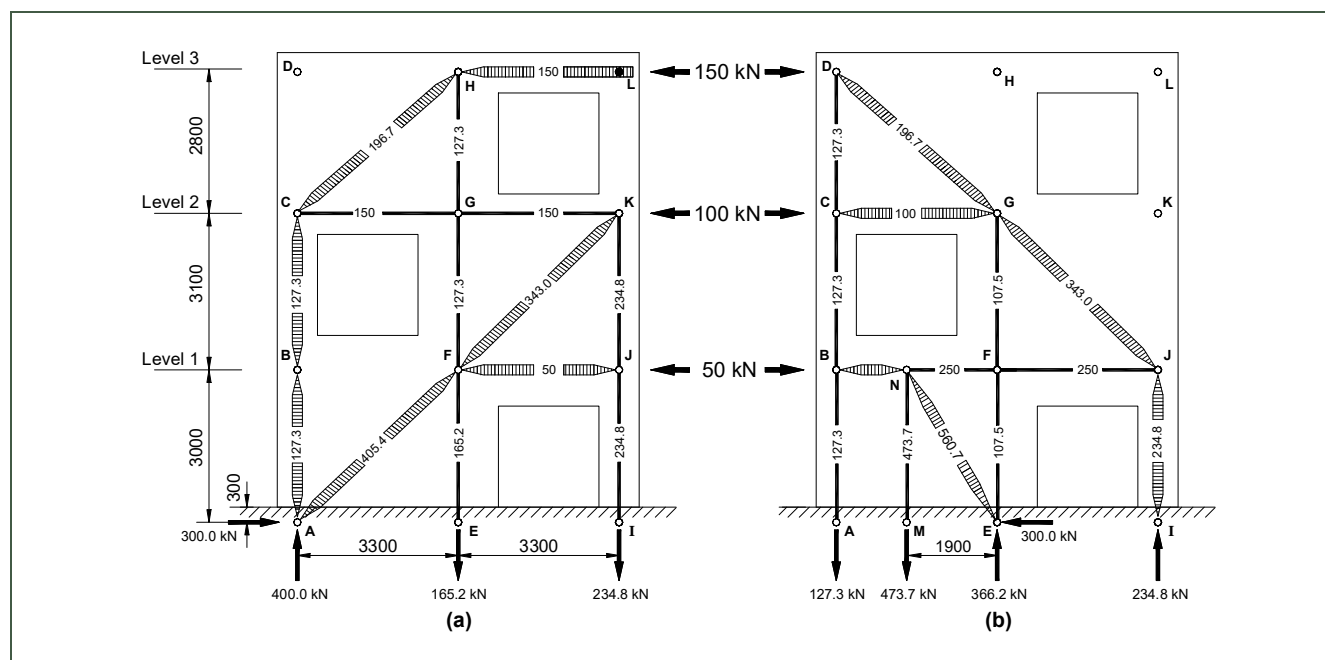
Strut-and-Tie Models for Masonry Wall (seismic loading only)
